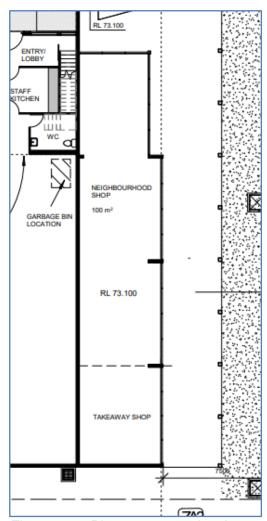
Plan extract showing potential link between take-away shop and neighbourhood shop.
